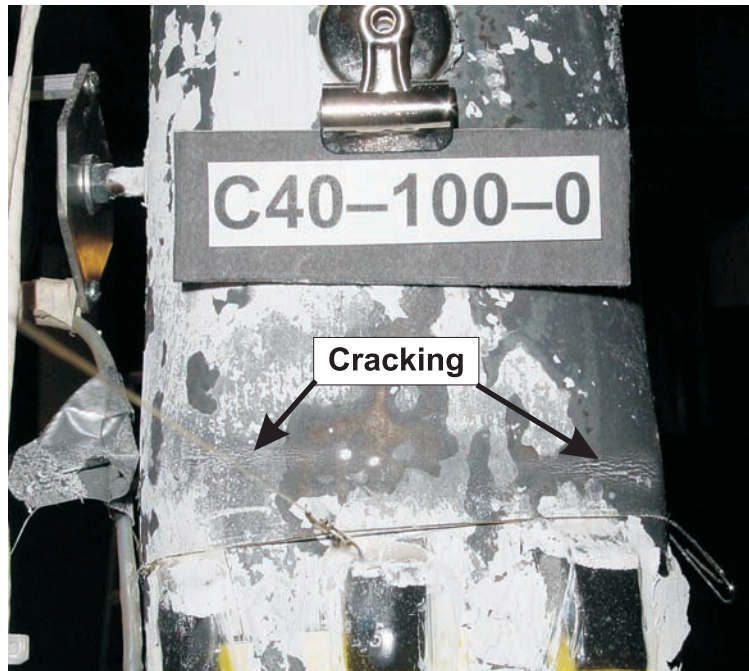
Initial Cracking at Edges of Local Buckle (Load Step +8), Specimen C40-100-0
